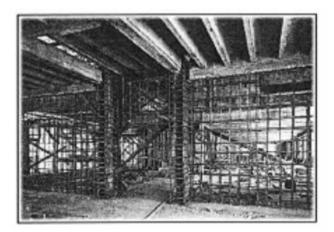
Construction of a shear wall (Techniques of Seismic Strengthening for Concrete Structures)
